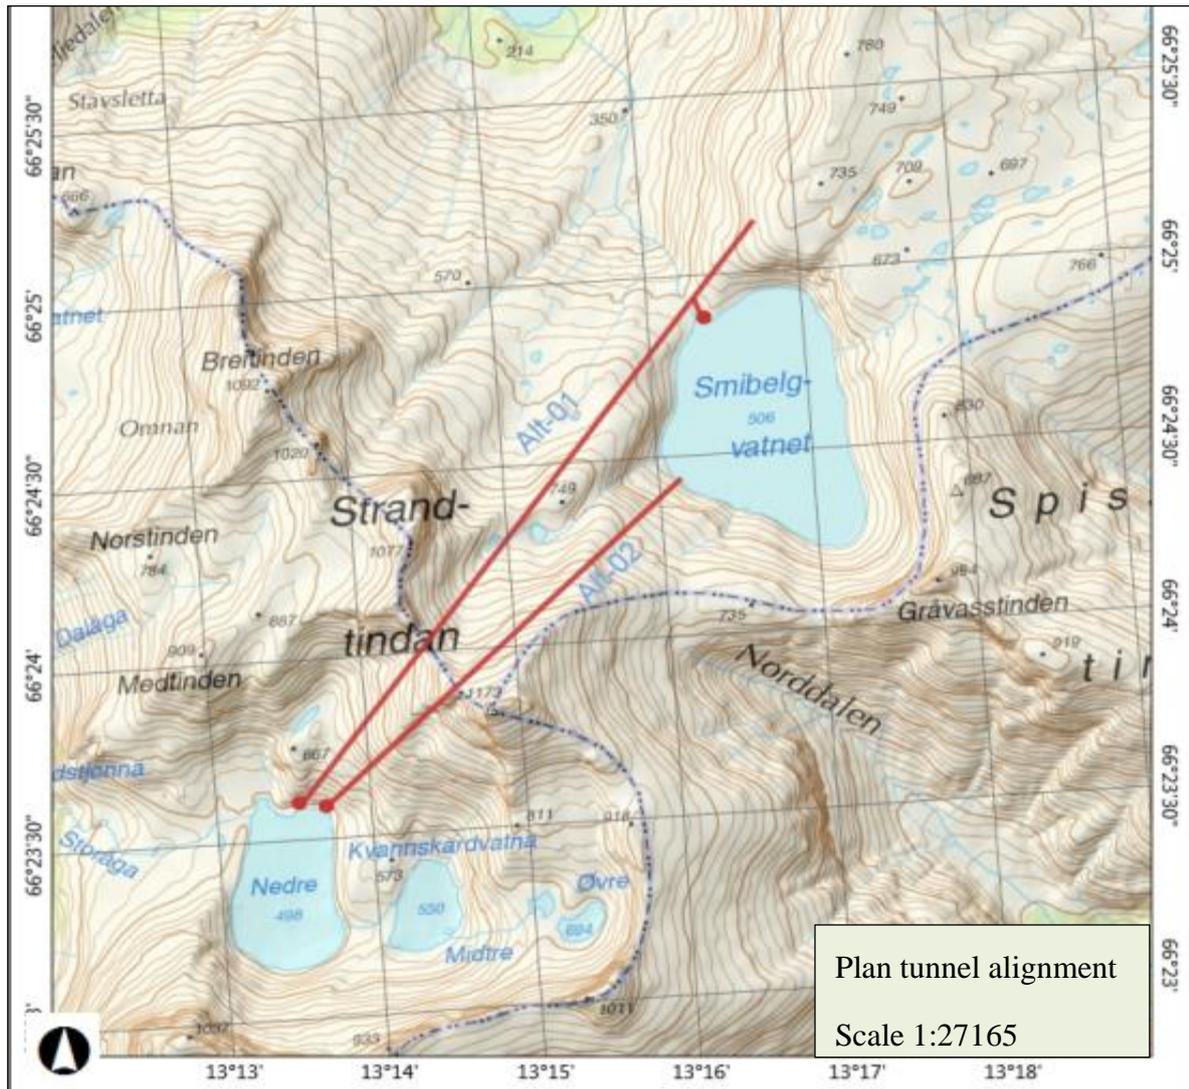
Alternative Tunnel Development plan Source: (Møre og Romsdal County council, 2000)
